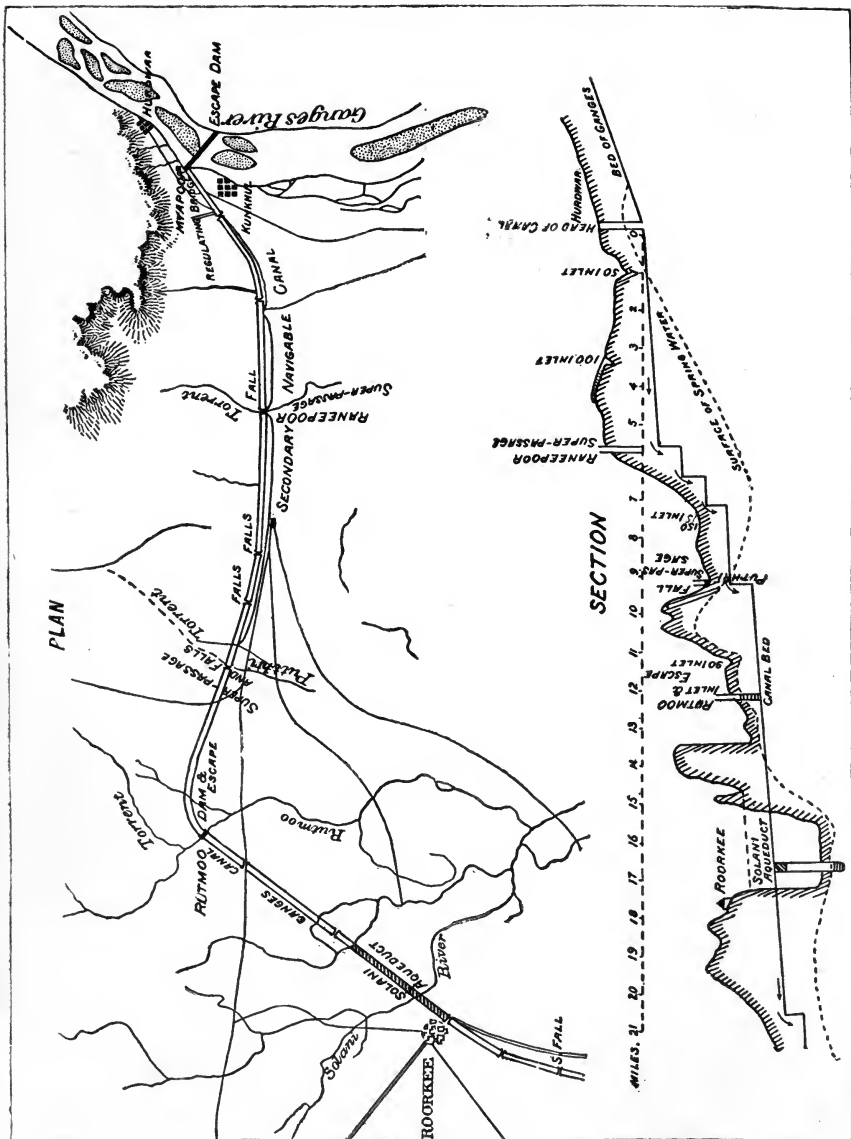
PLATE I.—PLAN AND CROSS-SECTION OF GANGES CANAL, HURDWAR TO ROORKEE, INDIA.
